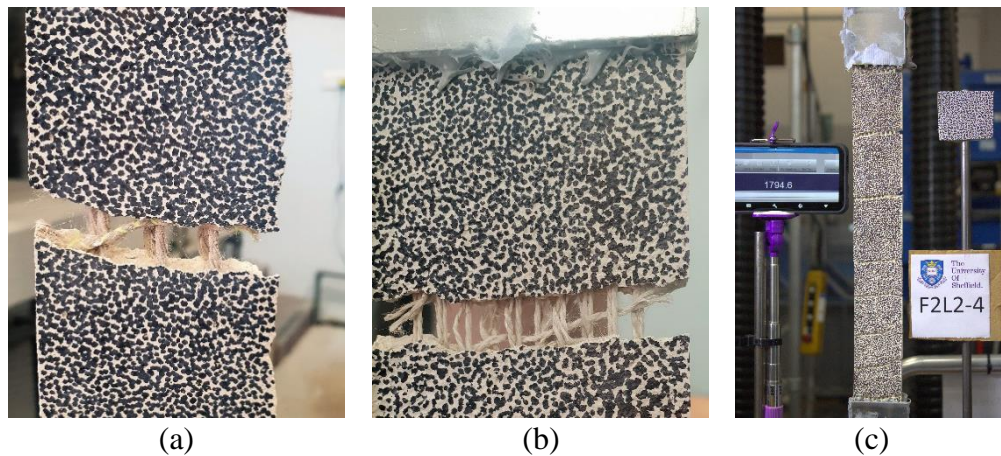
(a) F1-TRM at failure (slippage); (b) F2-TRM specimen at failure (rupture);
